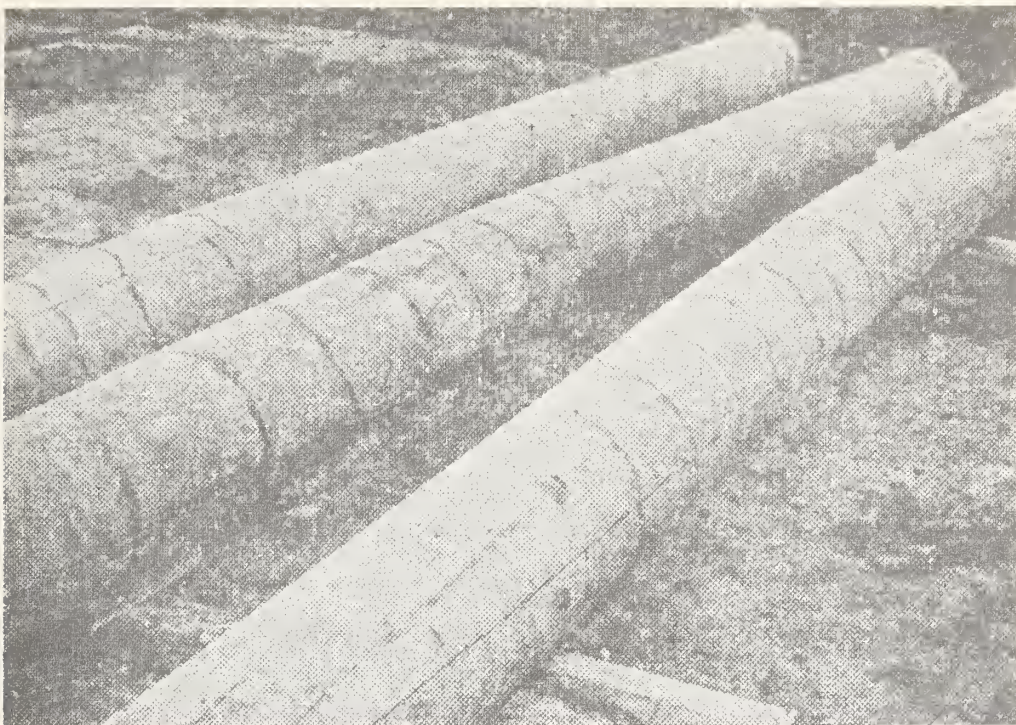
Damaged piles pulled out from the ninth pier of the Higashi-Koshenkyo bridge
